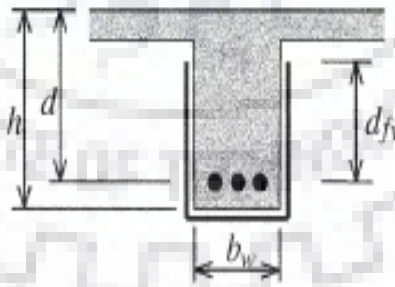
Geometry of beam showing FRP wrapping (U-wrap)
